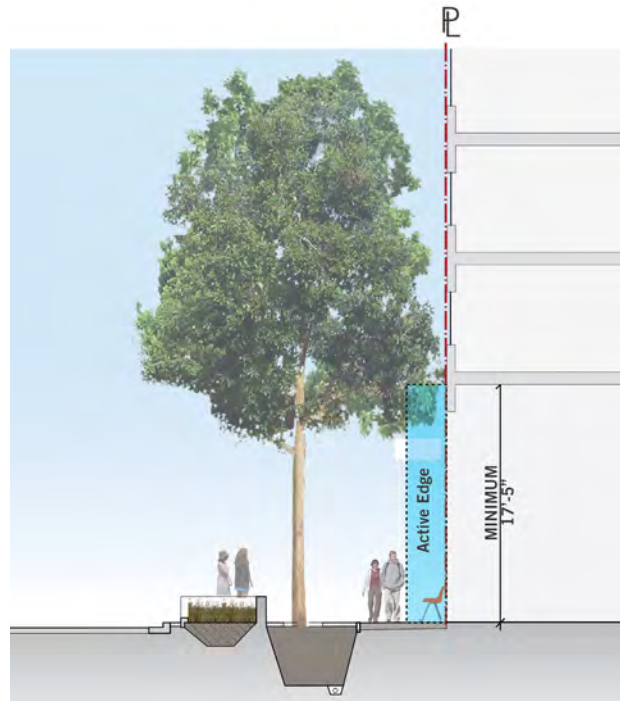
Neighborhood Street Zone Section showing a non-residential frontage.
